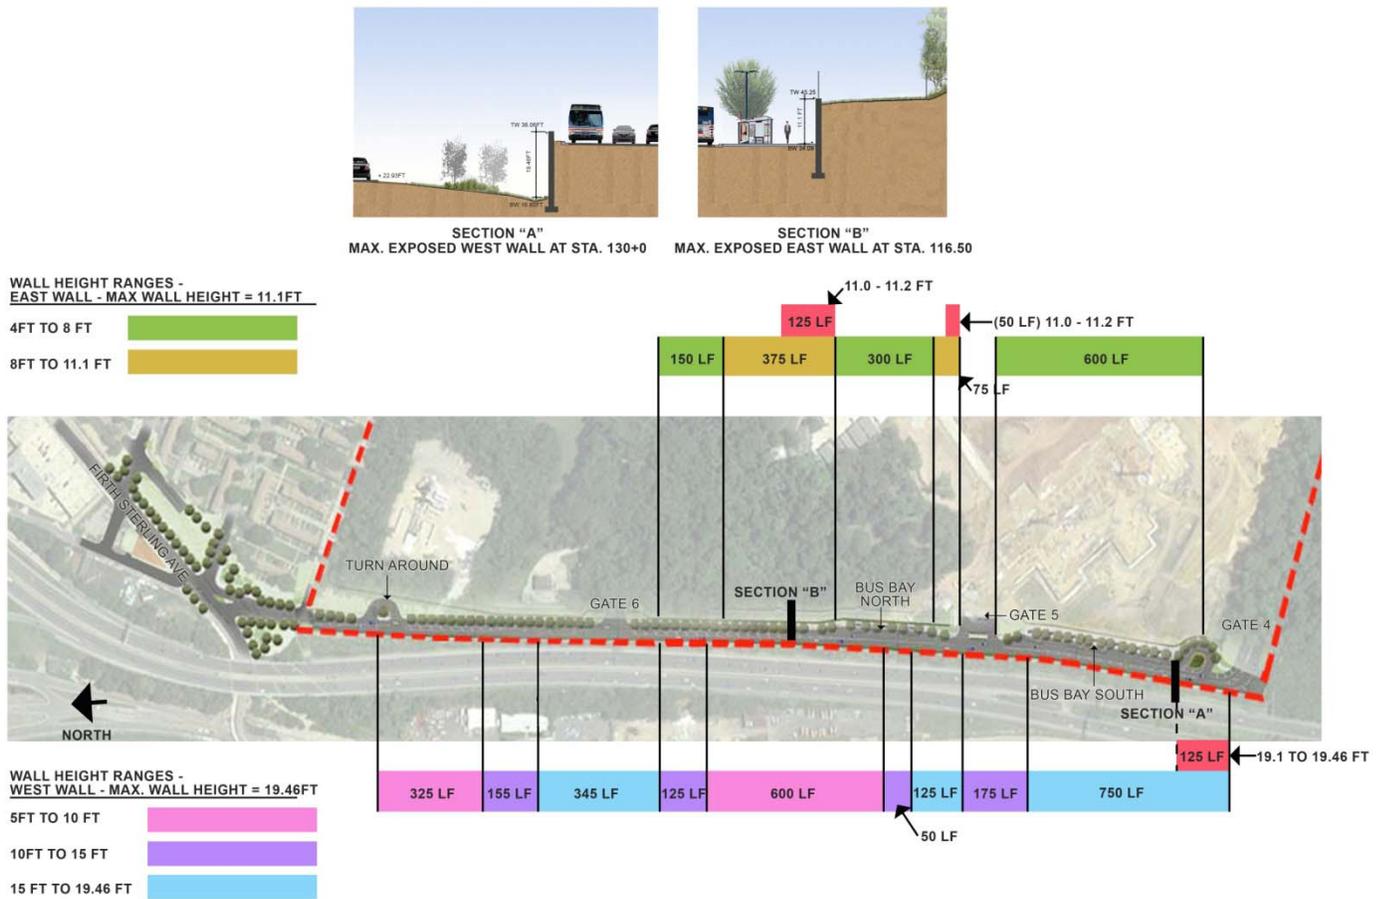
Wall elevations for both east and west access road walls. The different height ranges of exposed wall are shown in different colors. Both walls are completely veneered in decorative stone (see fig. 4)
